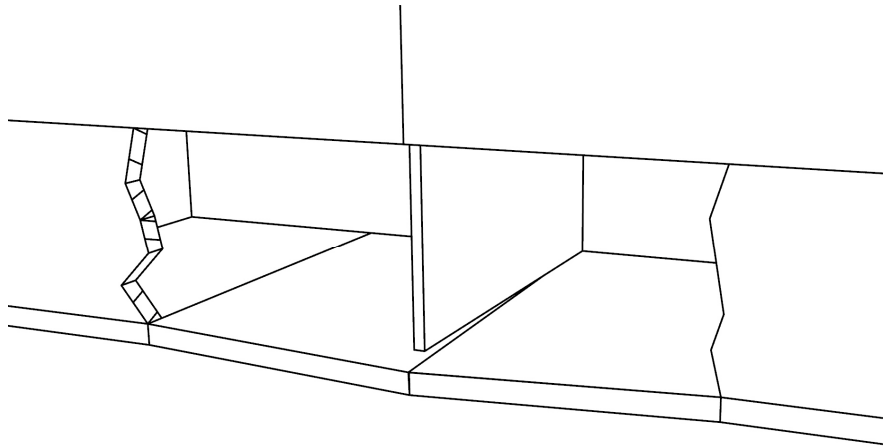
Settlement in foundation leading to decreased support to the loadbearing wall.
